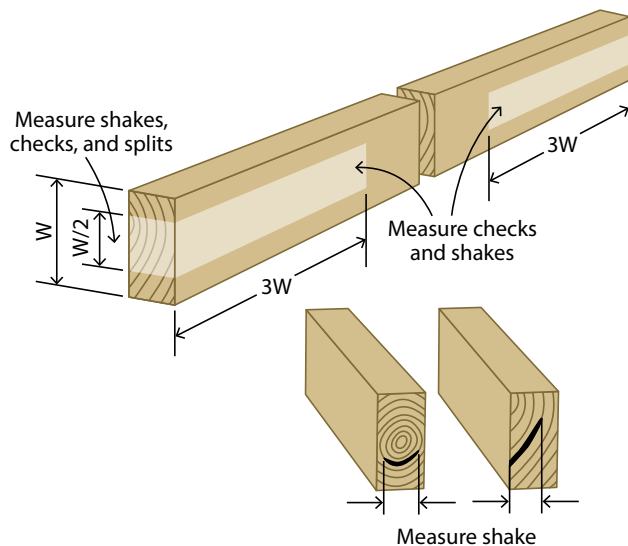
Beams and stringer checks, shake, and split measurement.
